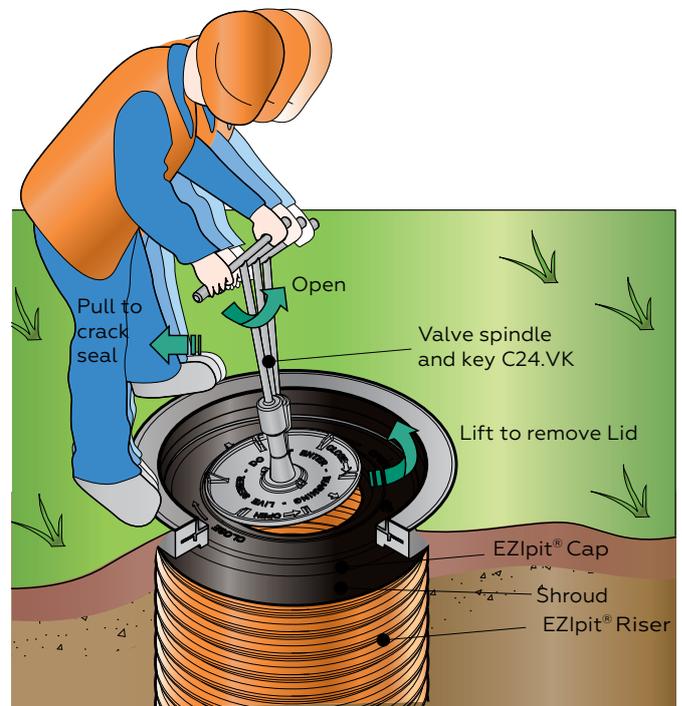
Removing the EZIpit® Lid from the Cap for Sewer Inspection or Vacuum Testing.
